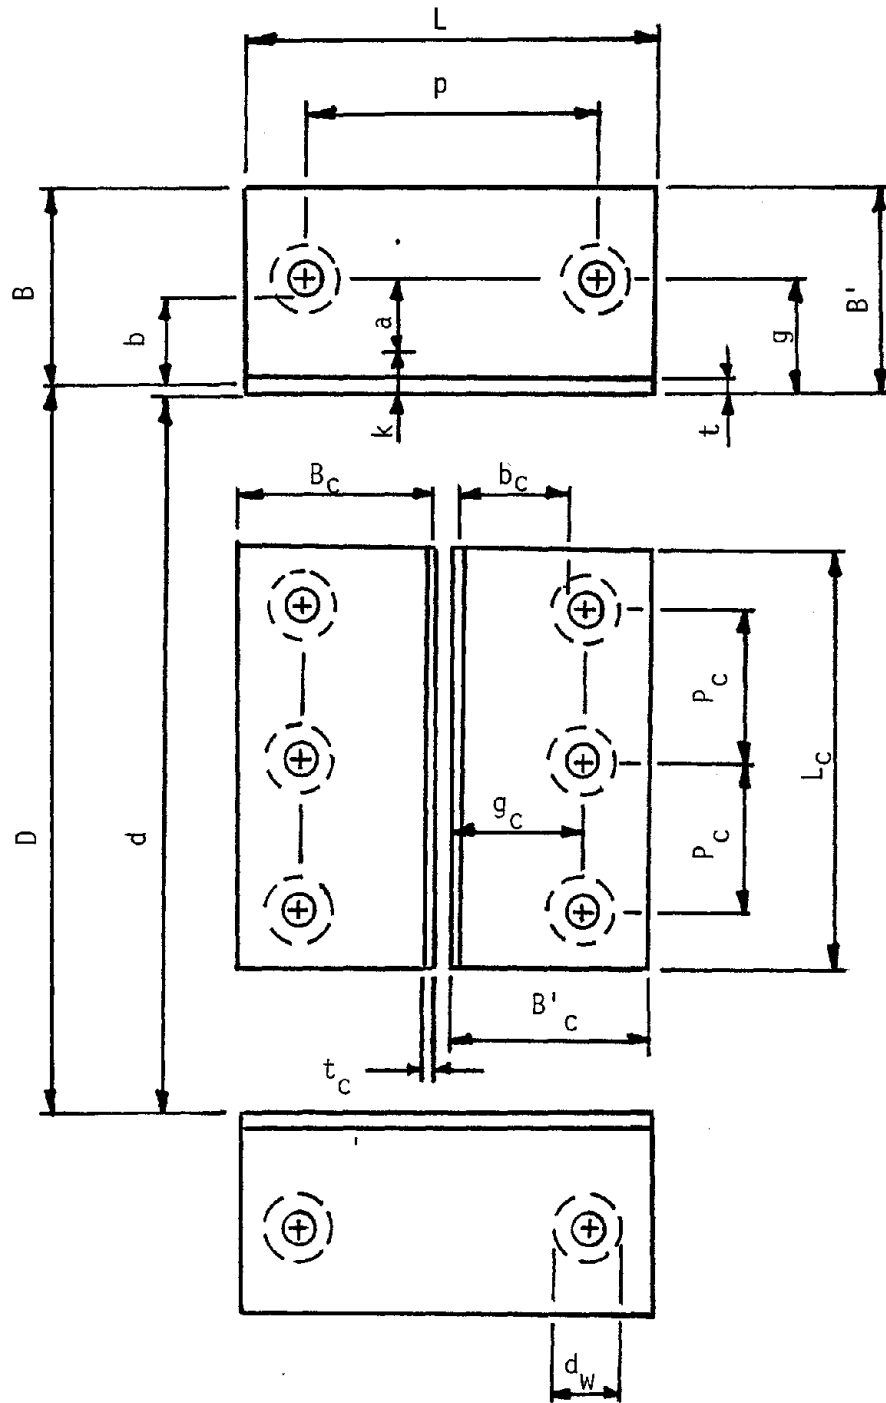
NOMENCLATURE FOR CONNECTION ELEMENTS
